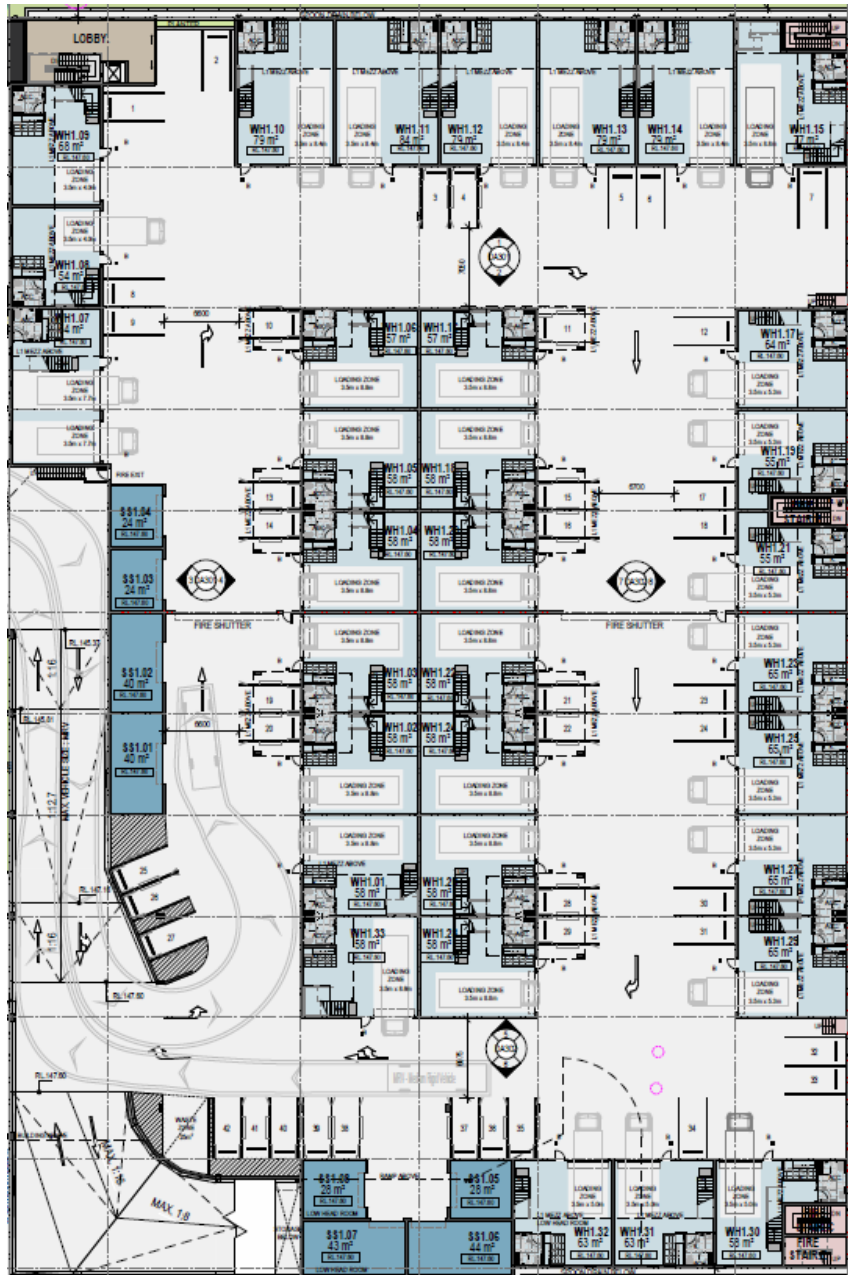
Level 1 Floor Plan (Source: SBA Architects)
